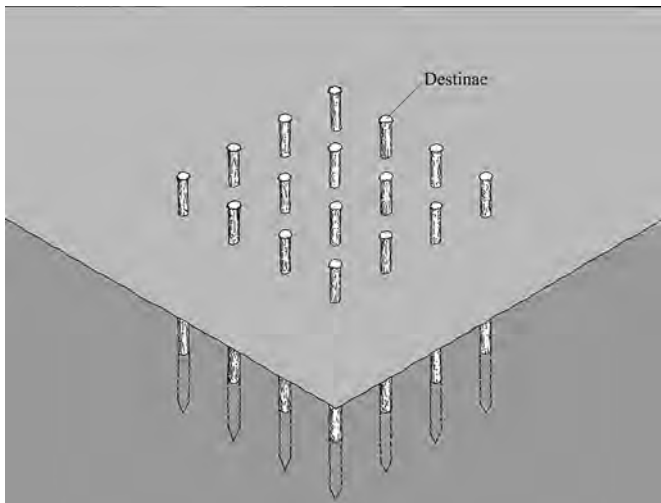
Reconstruction of piles (*destinae*) installed in the first phase of building a Category 1 form (C. J. Brandon).
